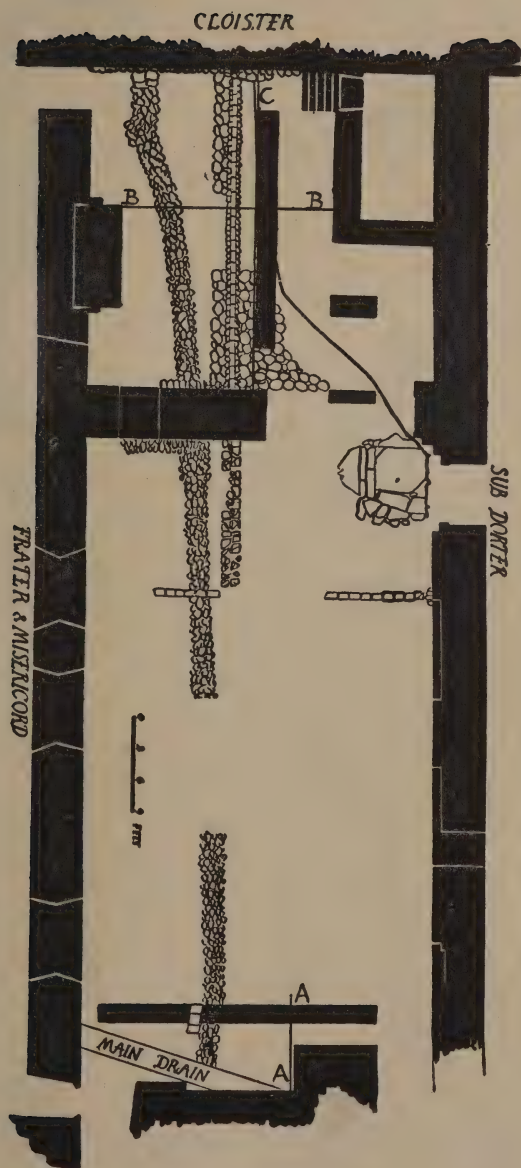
PLAN OF WARMING HOUSE AND COURTYARD.
